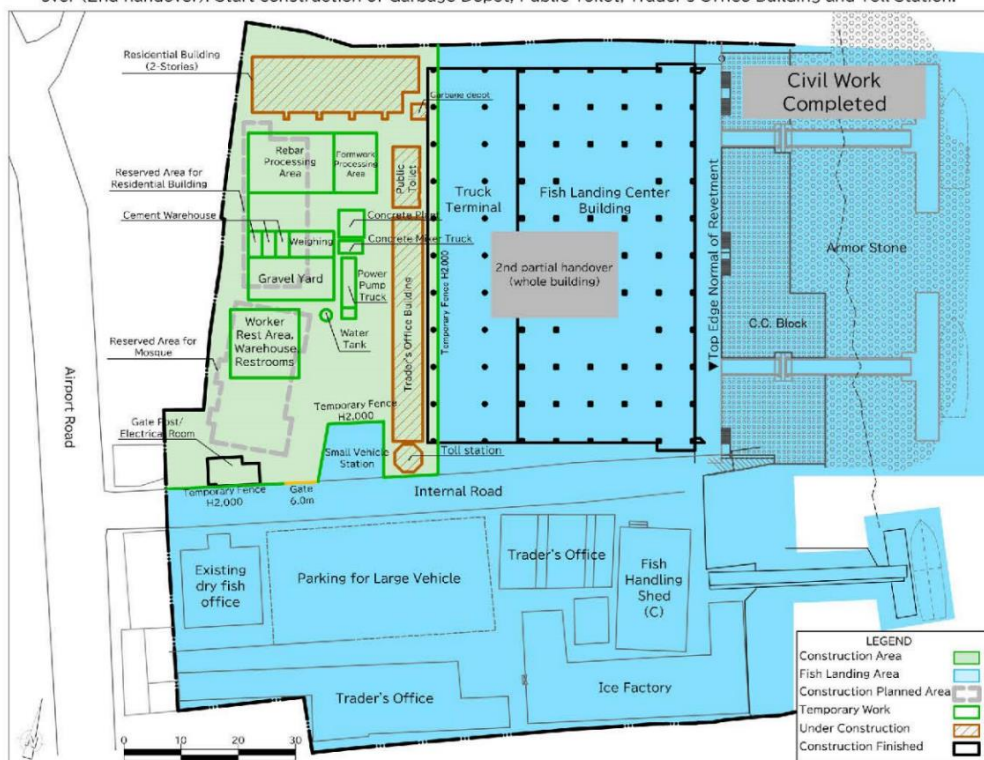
Temporary construction plan for each phase of building construction, (5) and (6)
